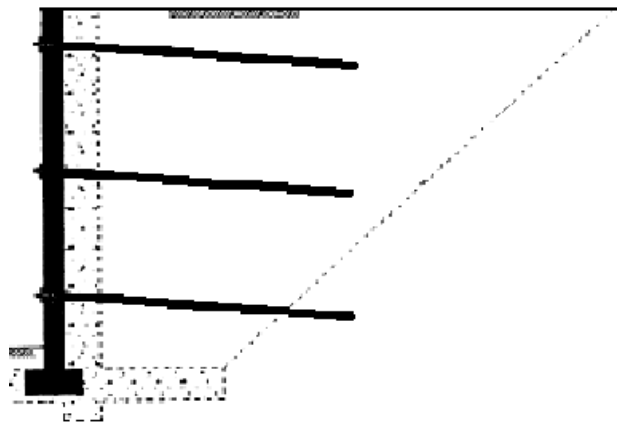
Soil Nail Wall System Replacing Cast-in-Place Wall [20]
